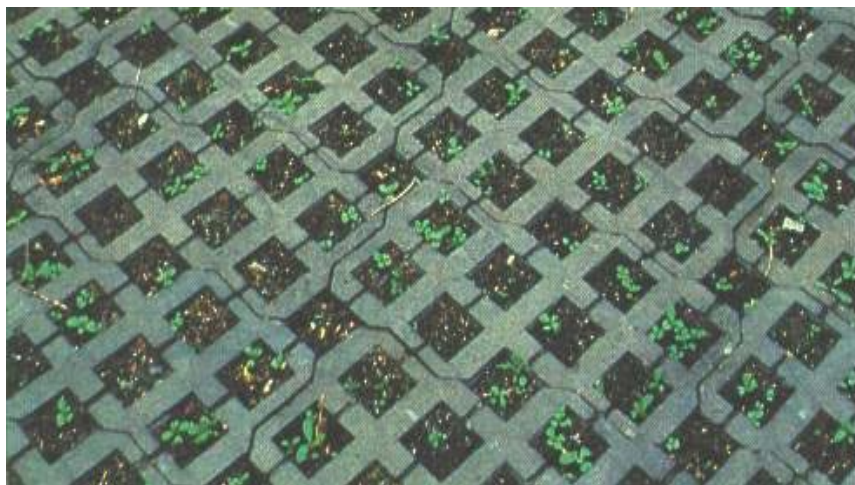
Example of Modular Block Porous Pavement.
